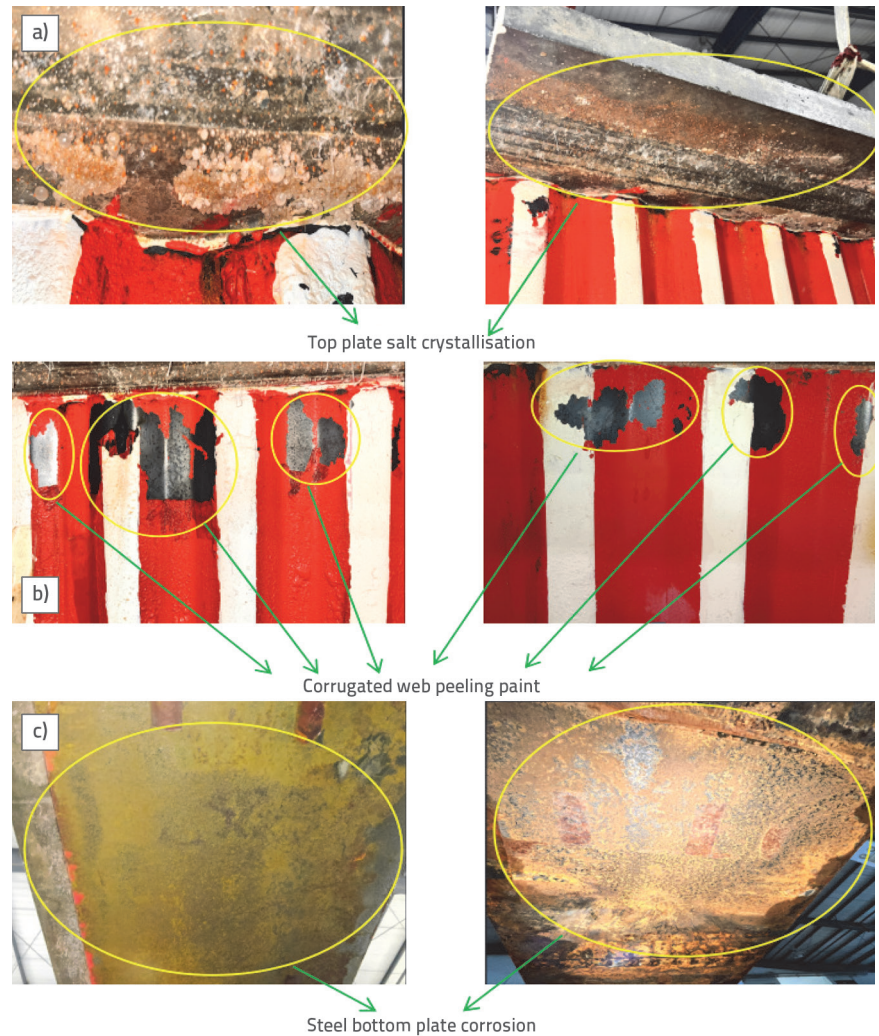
Surface of the girder after the corrosion test: a) Top plate salt crystallisation; b) Corrugated web with corroded and peeling paint; c) Bottom plate corrosion
